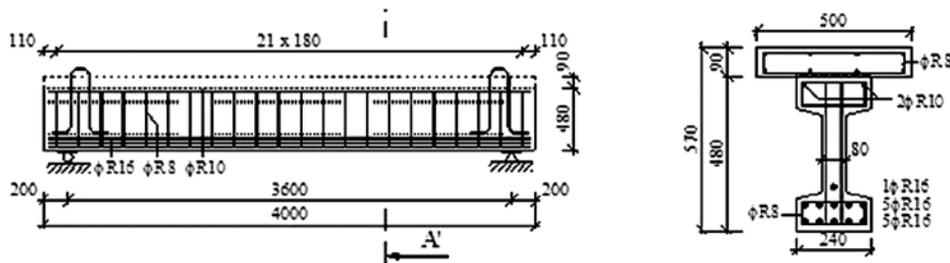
Geometry and scheme of reinforcing of the experimental beams
